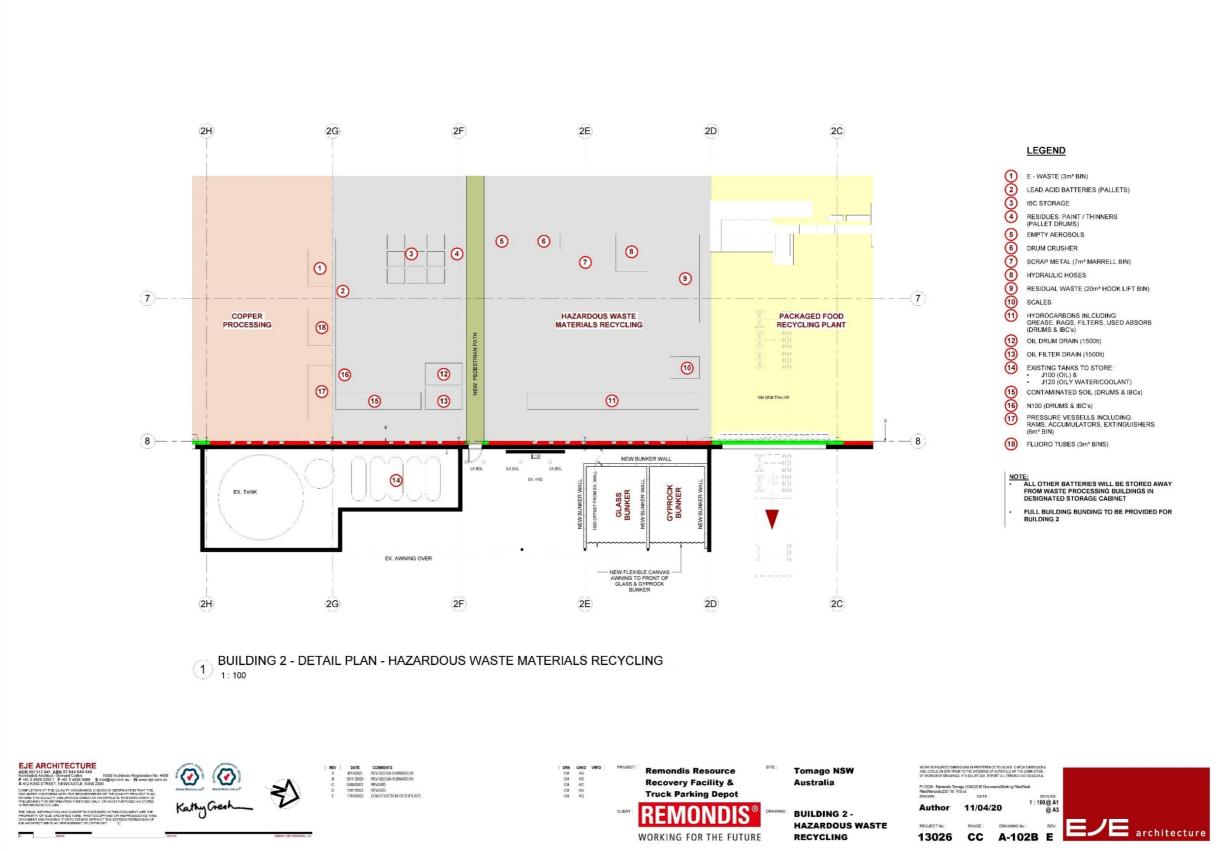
The Tomago Facility: Building 2 General Arrangement (2 of 2)
